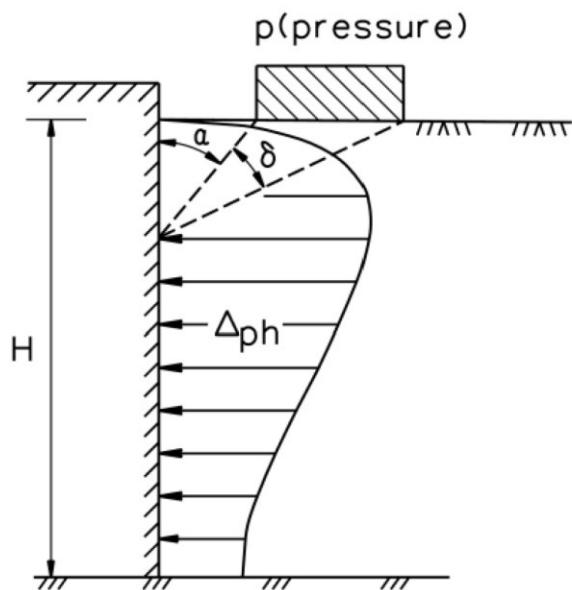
Horizontal Pressure on Wall Caused by a Uniformly Loaded Strip
